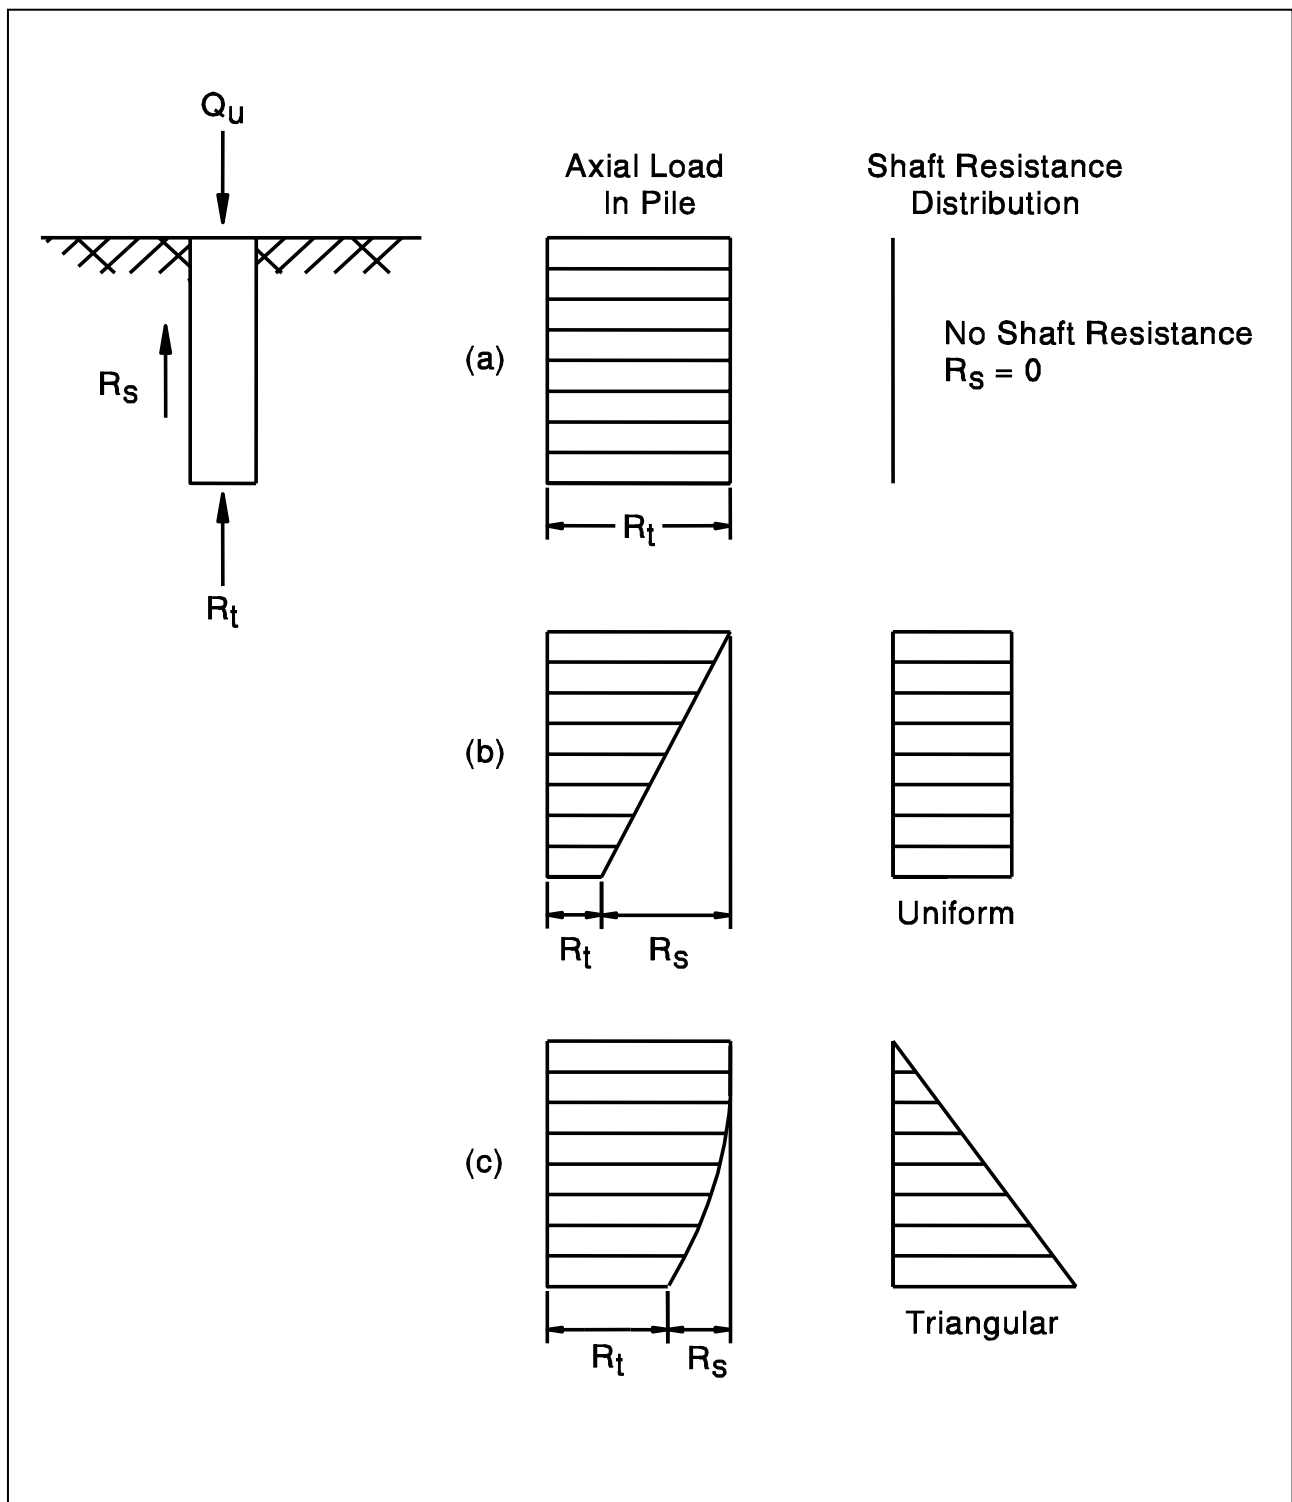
Typical load transfer profiles (FHWA, 2006a).
